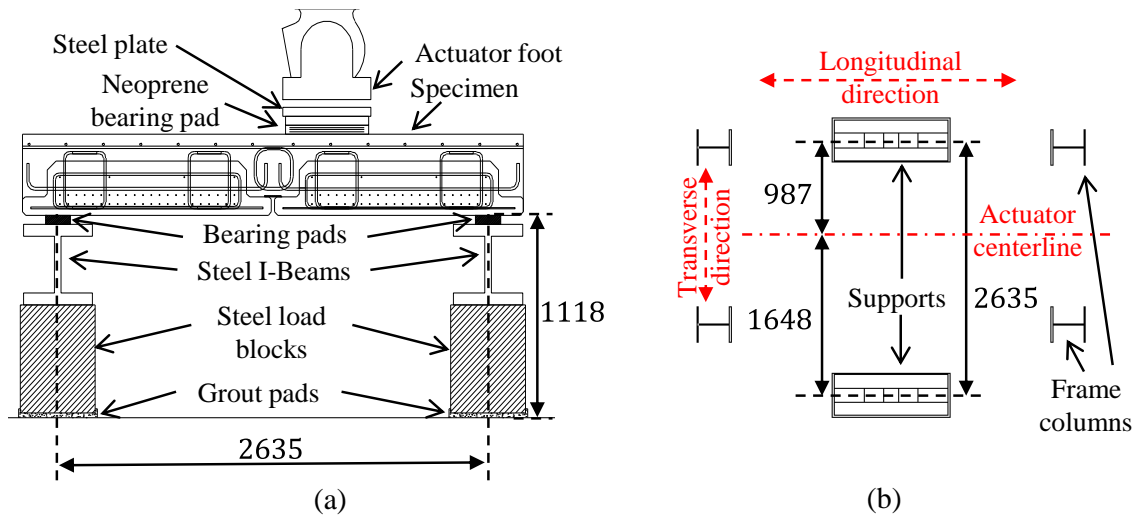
Testing frame layout: (a) supports elevation and specimen layout and (b) supports plan layout (actuator centerline parallel to longitudinal joint). (units: mm, 1 mm = 0.0394 in)
